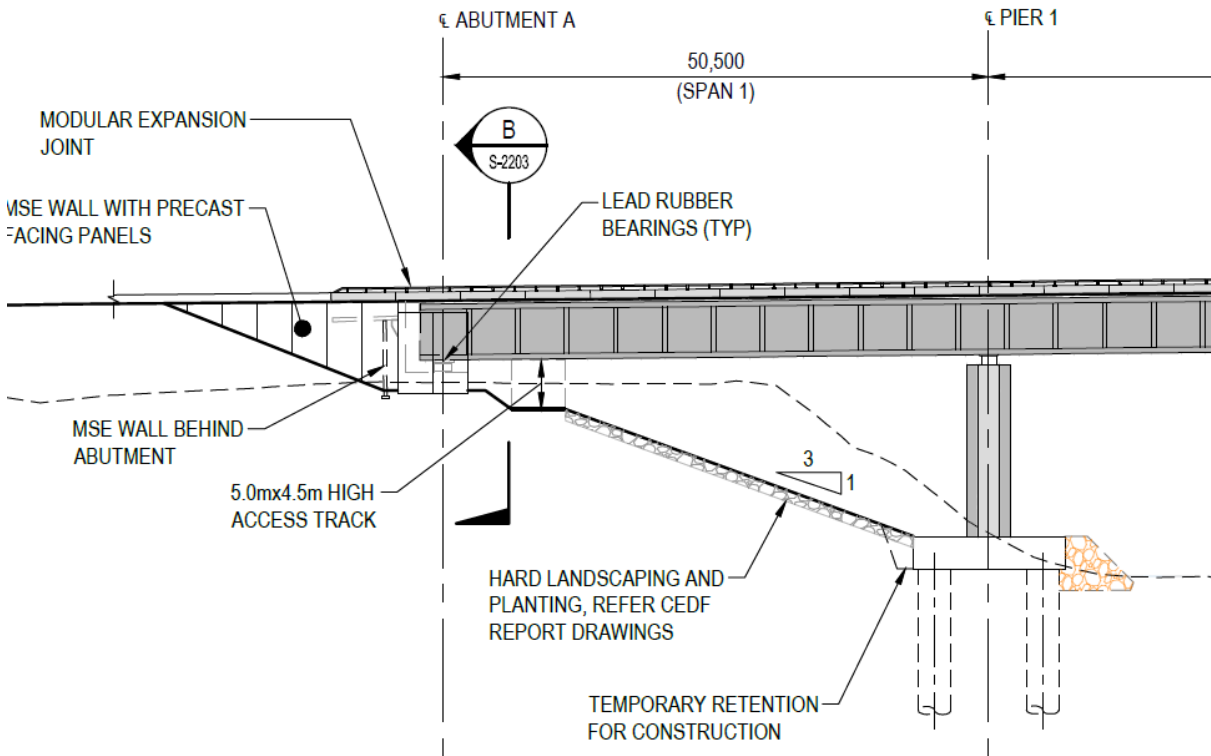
Details of the proposed ground modifications between the south abutment and Pier 1 (Advance, 2019).
